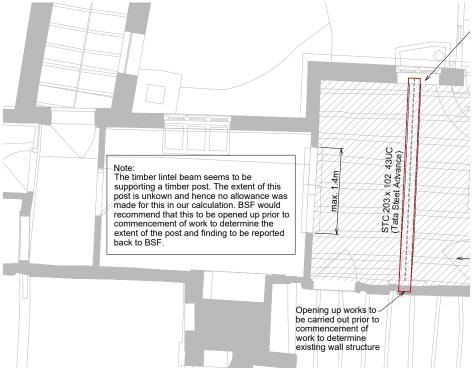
Proposed blow-up structural design drawing by BSF Consulting Engineers
